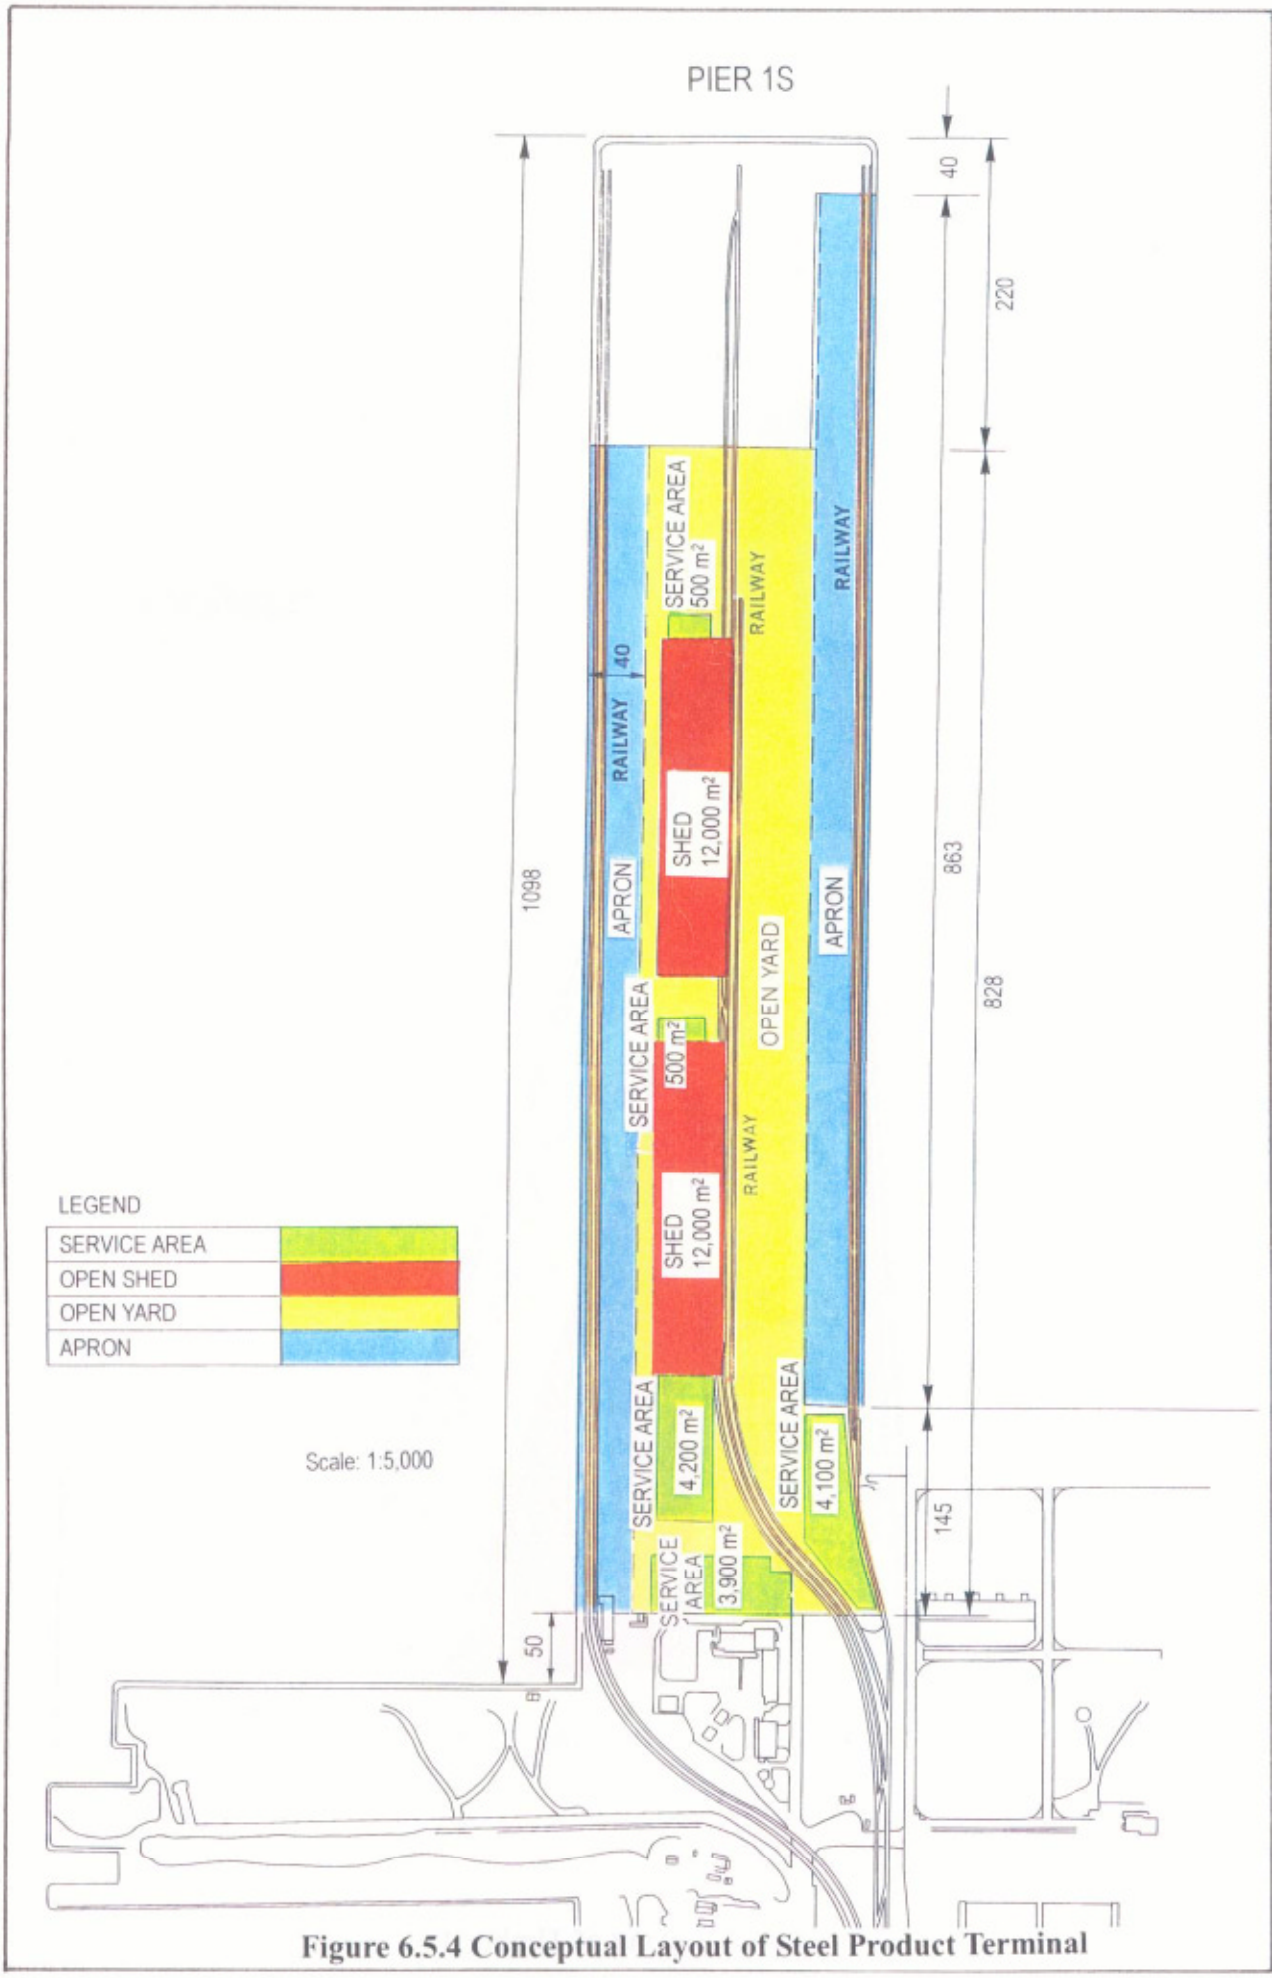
Conceptual Layout of Steel Product Terminal
